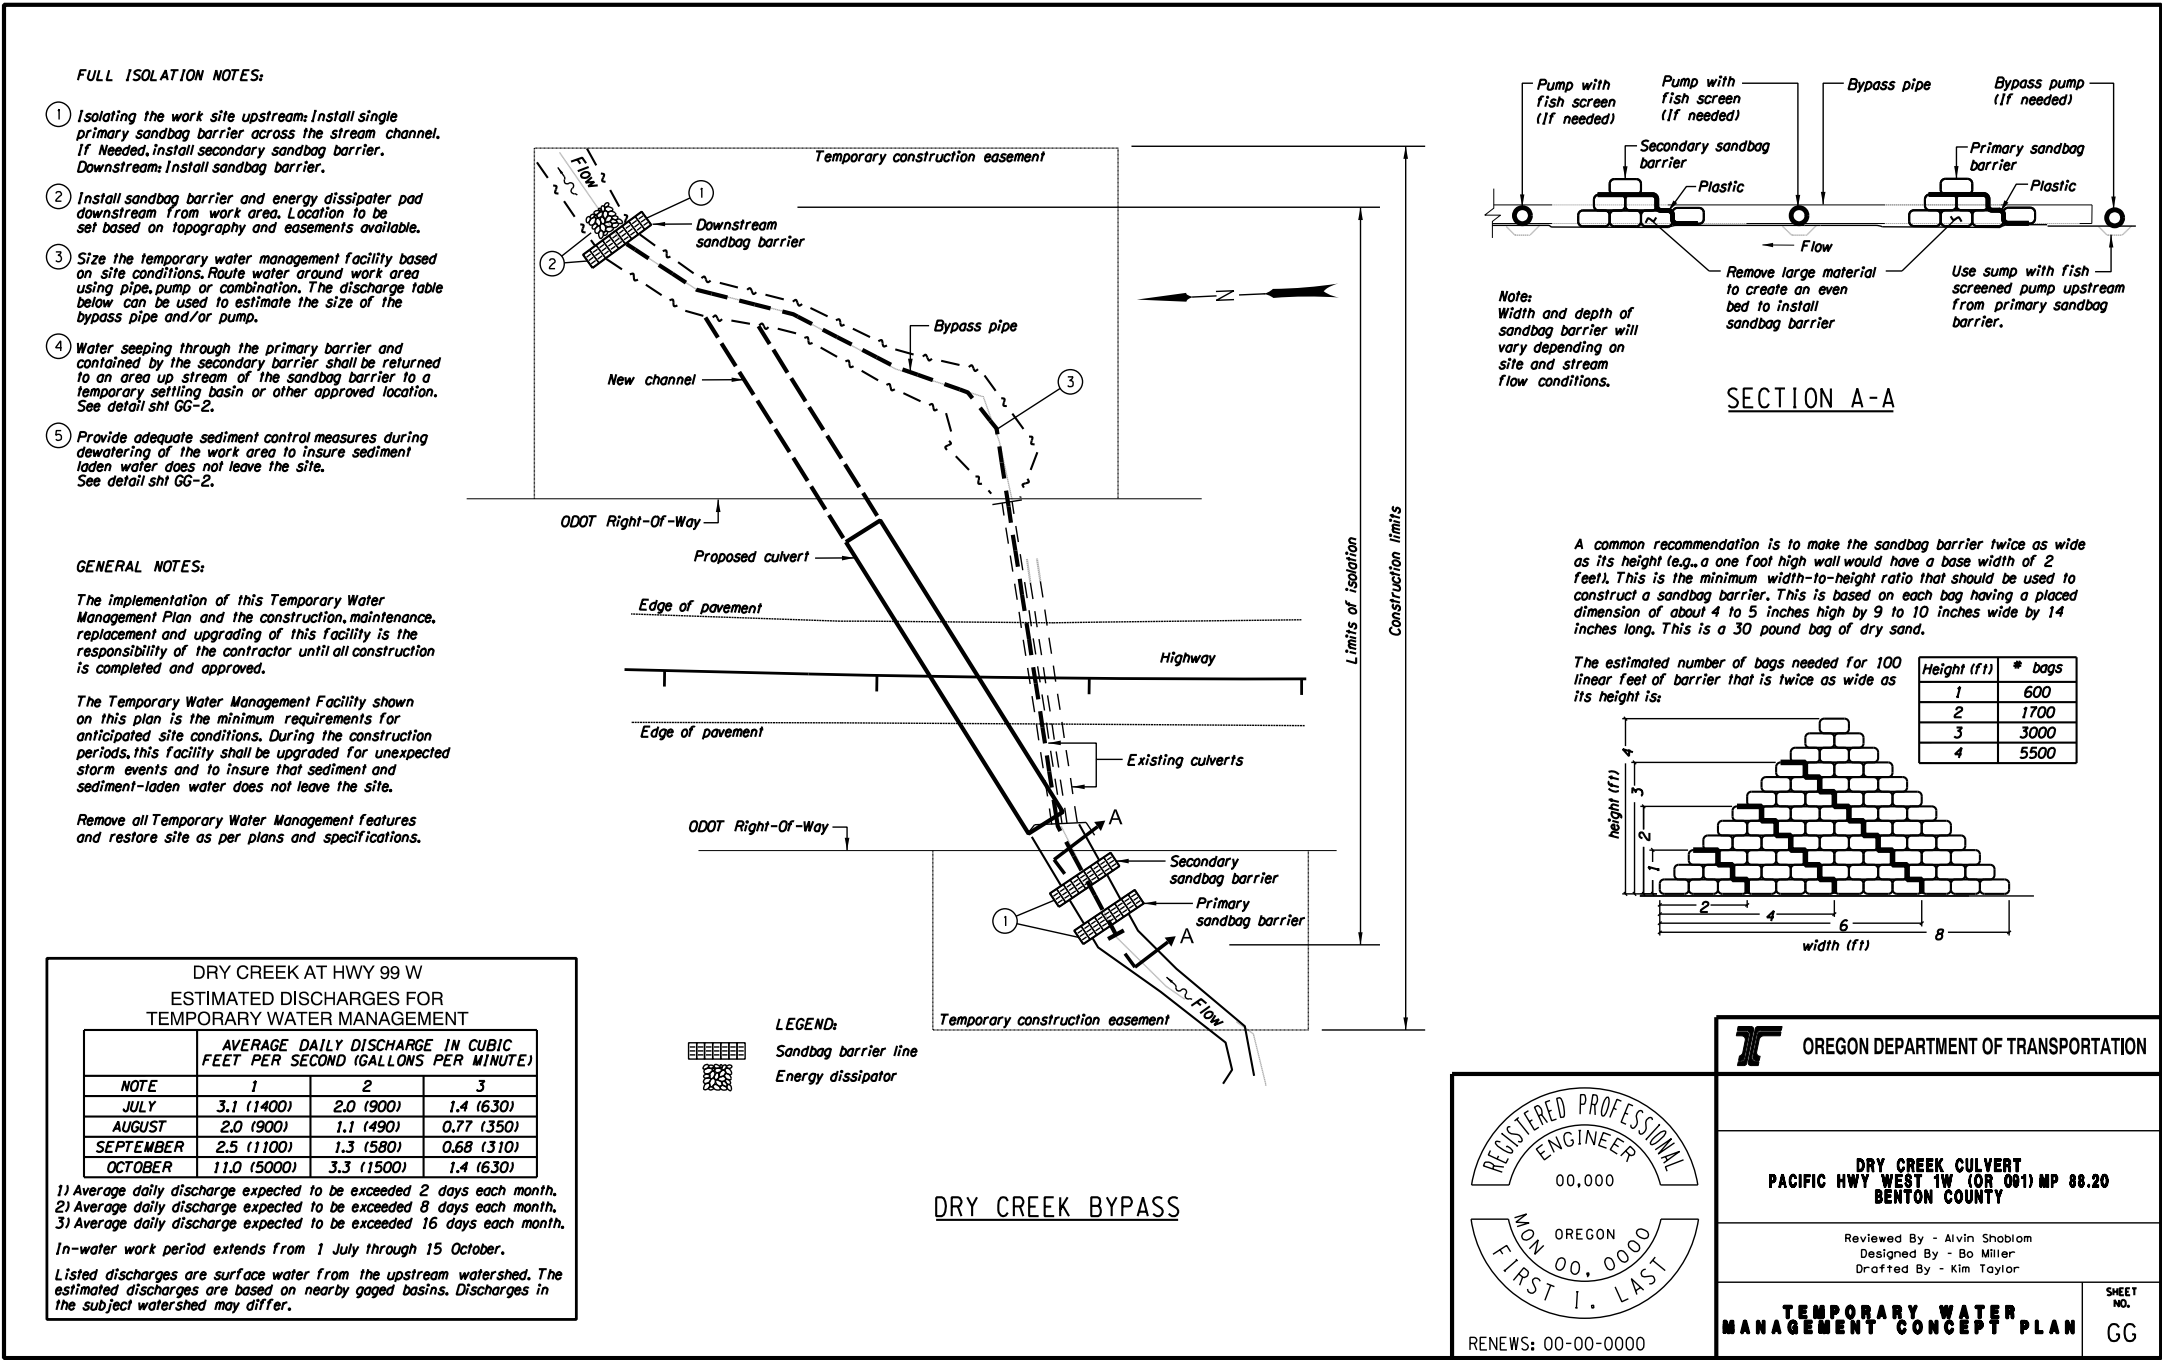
Example Drawing of a TWM Concept Plan (Full Isolation)
